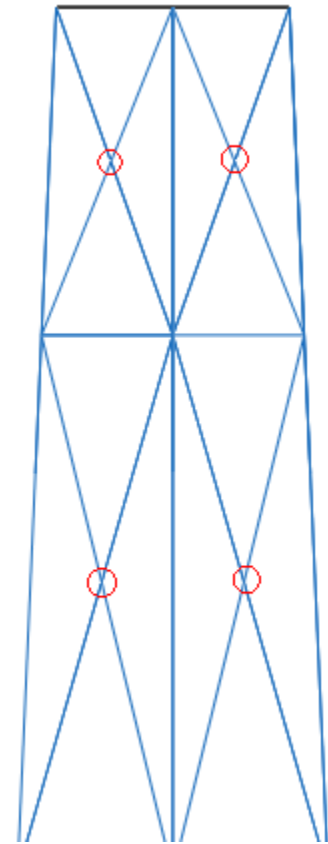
A View Showing UHPC Lattice Tower Cross Bracing Connections in the Finite Element Model
